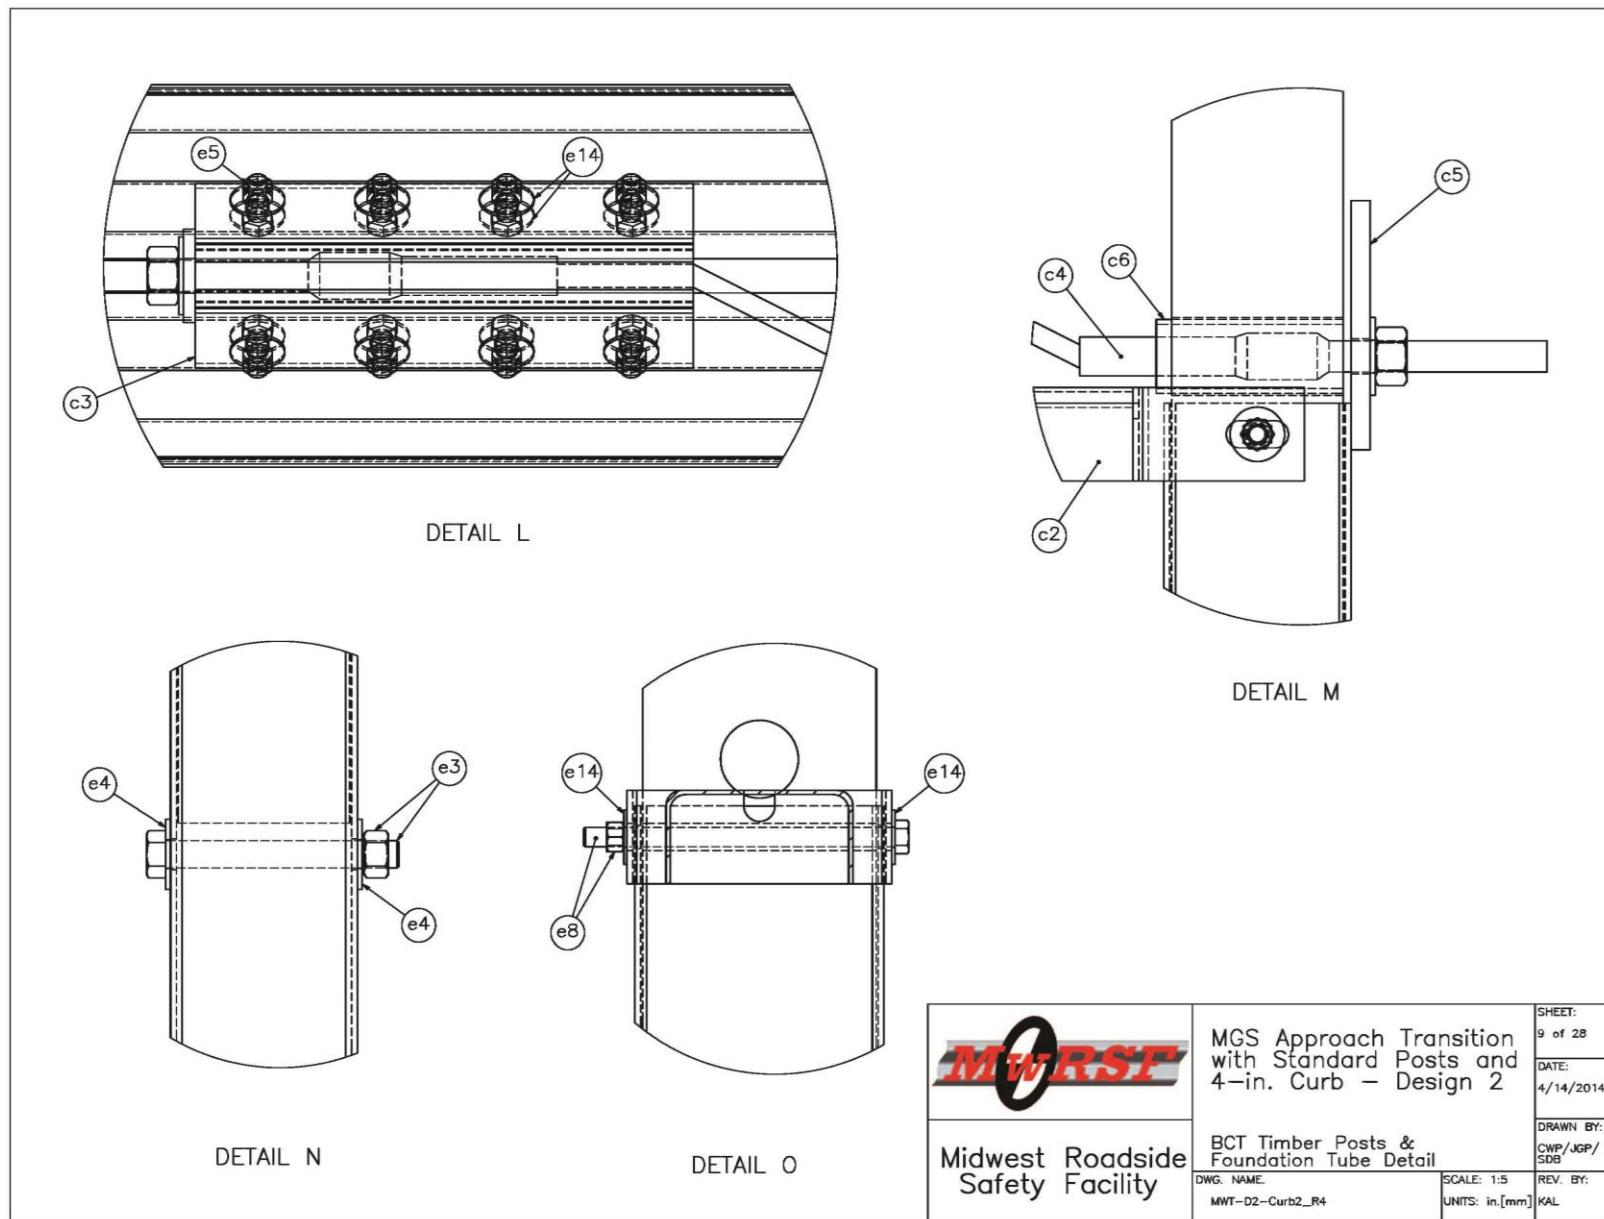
BCT Timber Posts and Foundation Tube Detail, Test Nos. MWTC-2 and MWTC-3
